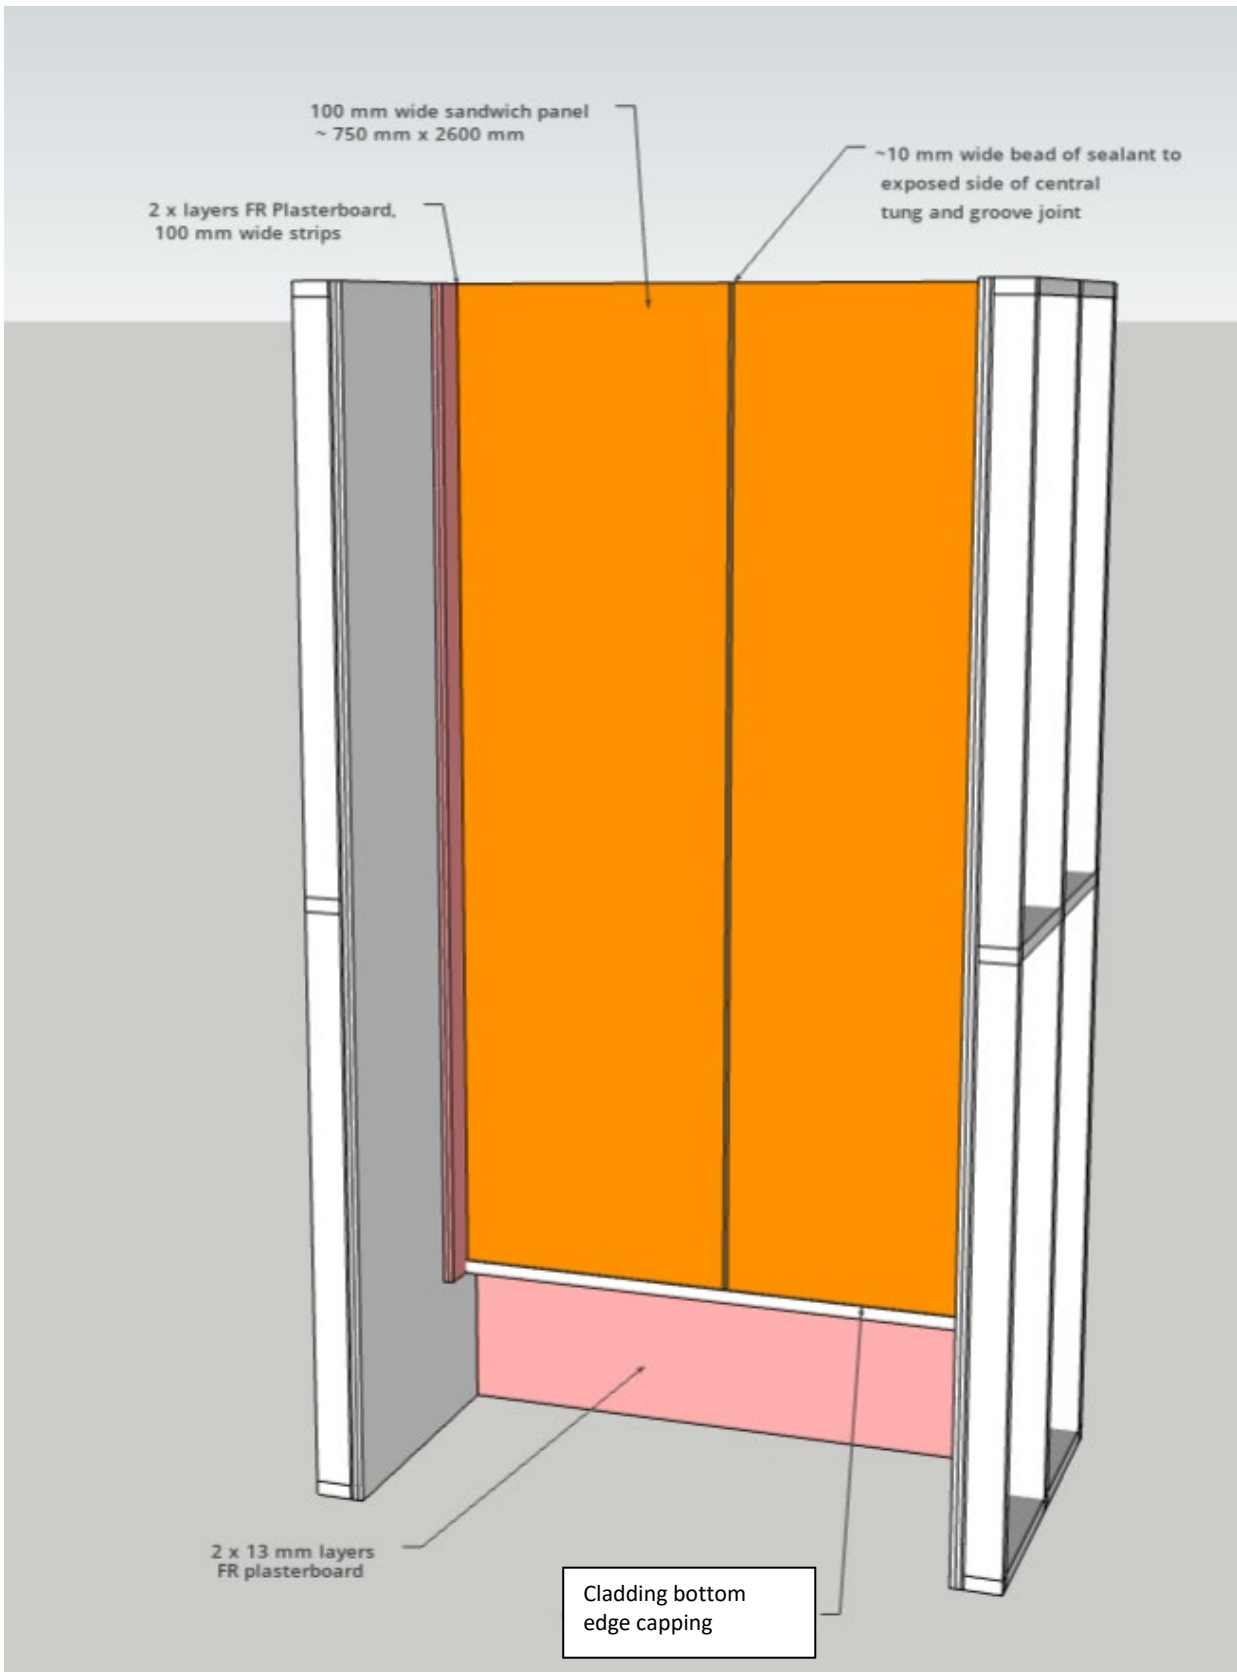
3-Dimensional drawing of sandwich panel specimen installed to test rig
